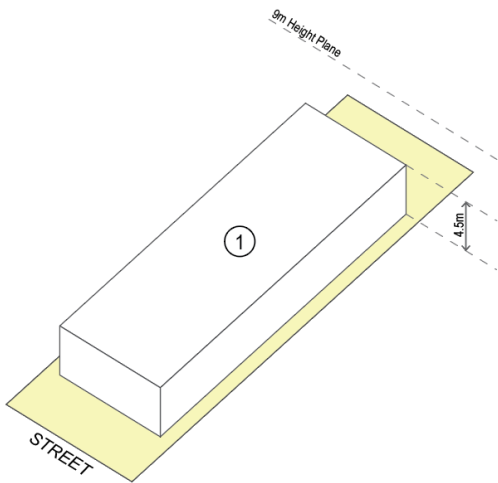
Massing of single storey dwelling house on a 450sqm site (non-FSPA)
